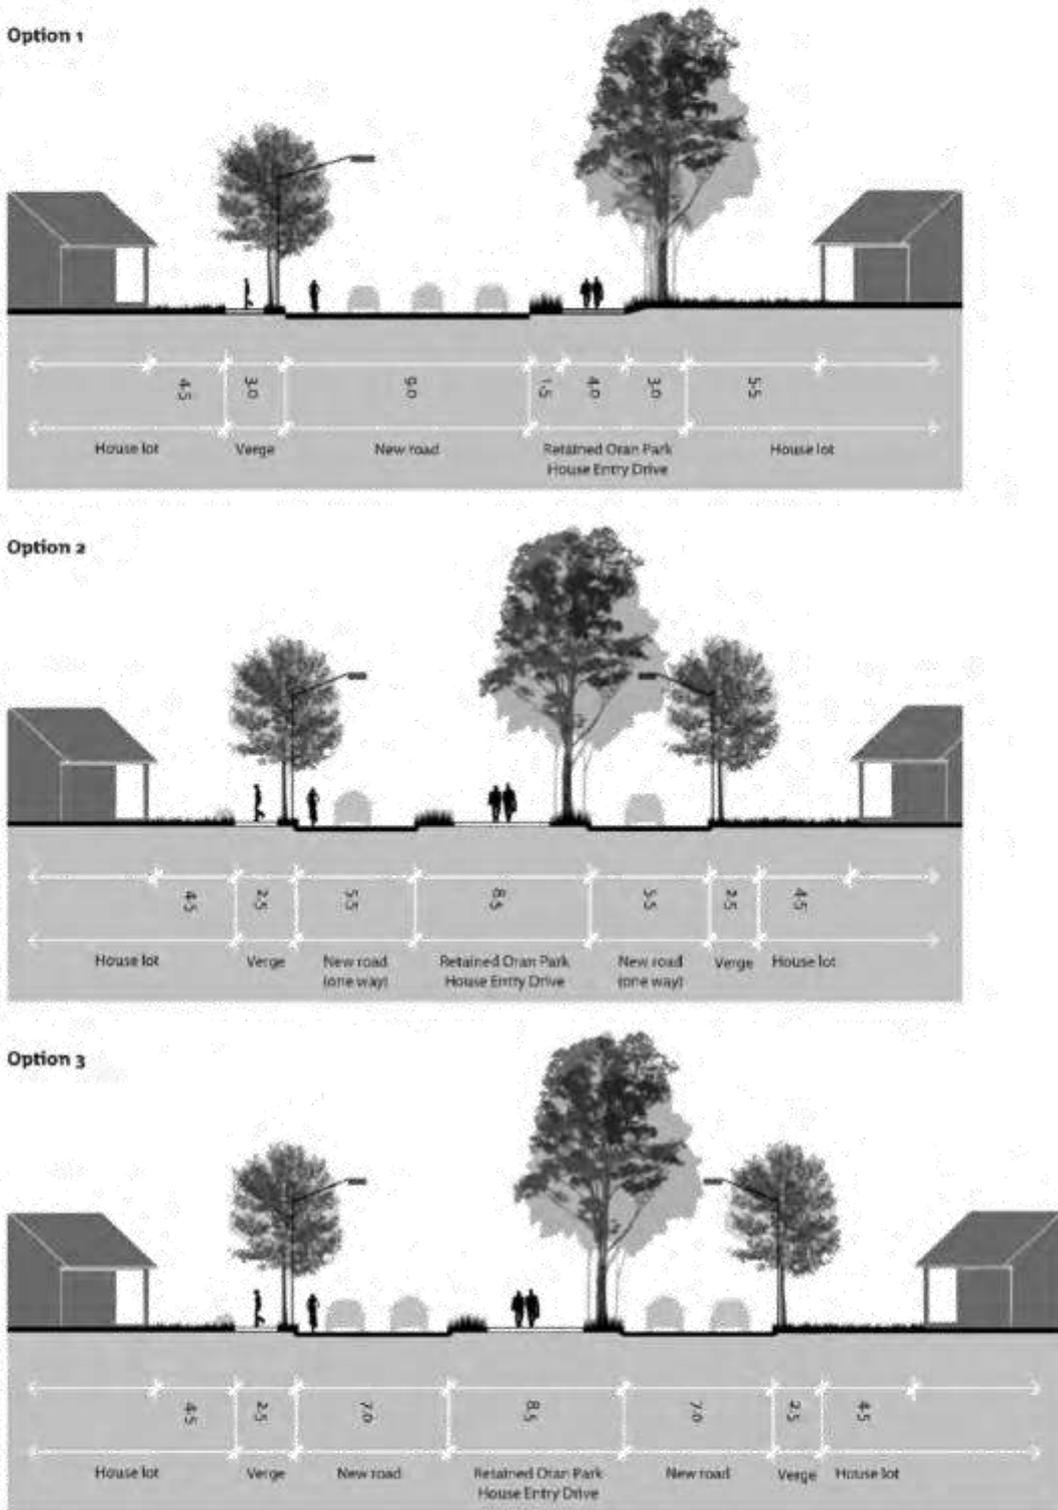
Indicative Dawson-Damer Drive sections (incorporating the historic driveway)
